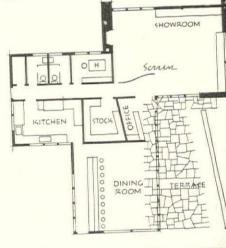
PHOTOS SHOW PLOT PLAN AND INSIDE AND OUTSIDE VIEWS OF A. G. DEWEY
